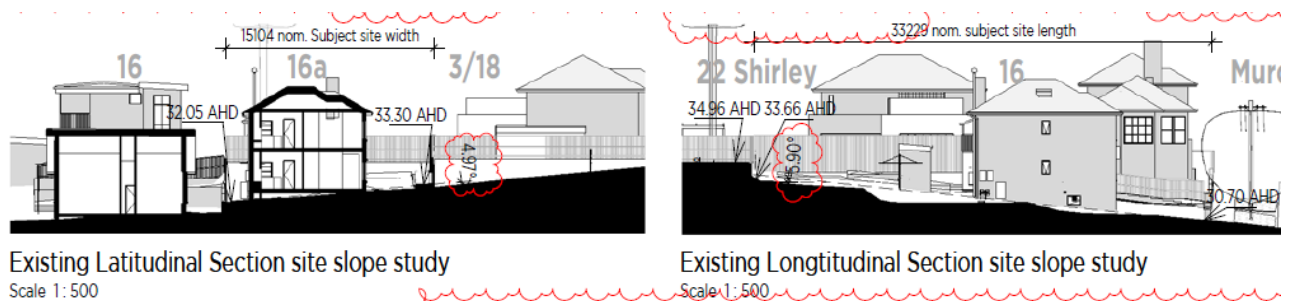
Plans showing the extent of slope across the site both in east - west direction and a north - south direction.
